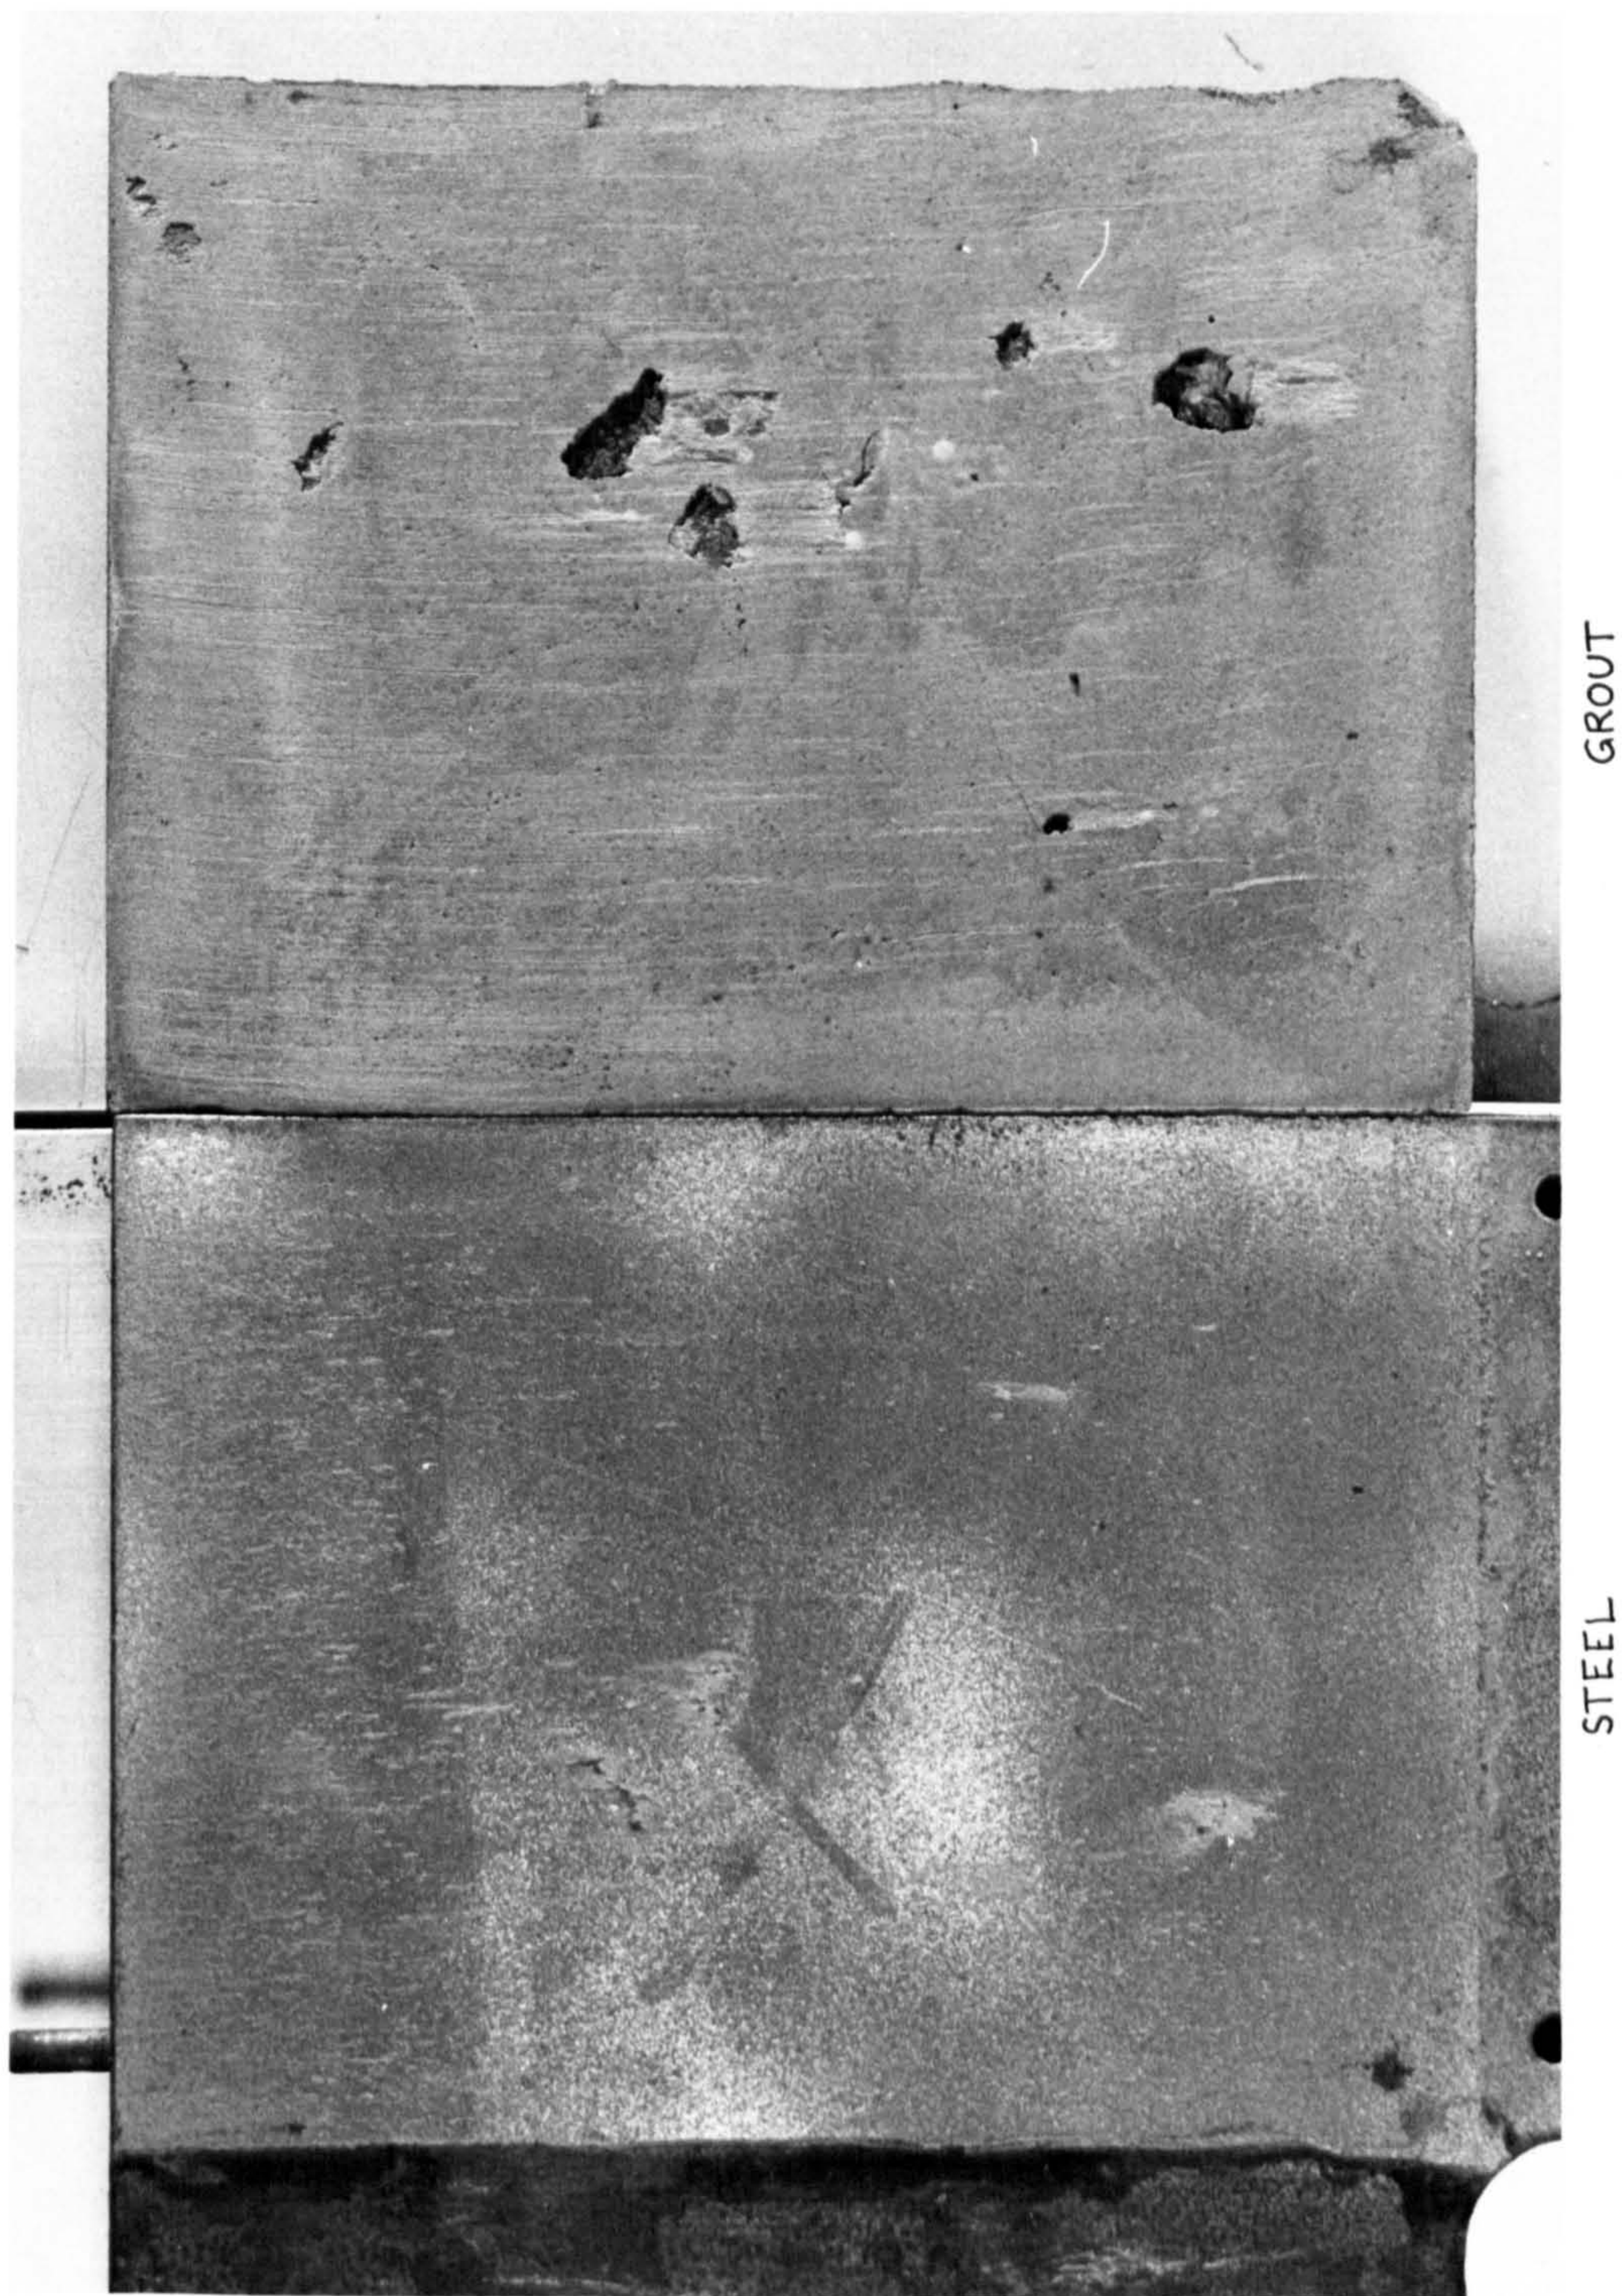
CLOSE-UP VIEW OF THE STEEL AND GROUT SURFACES AFTER SLIP FAILURE.
